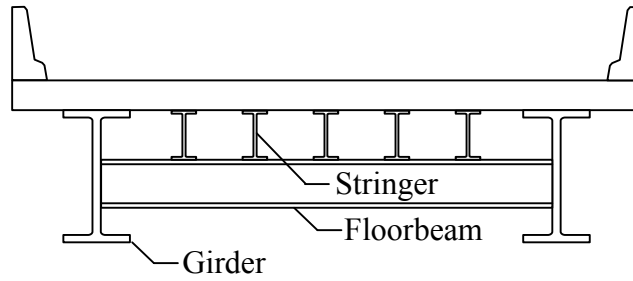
STEEL GIRDER-FLOORBEAM-STRINGER SYSTEM
